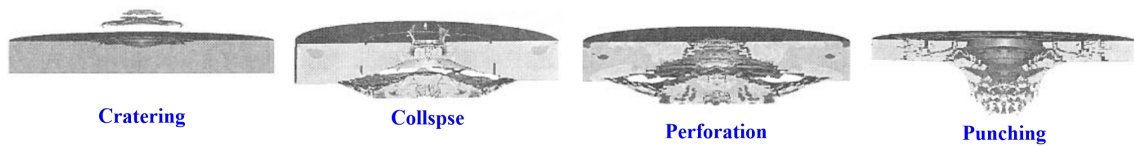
Typical damage mode of concrete panels caused by contact explosion [44].
